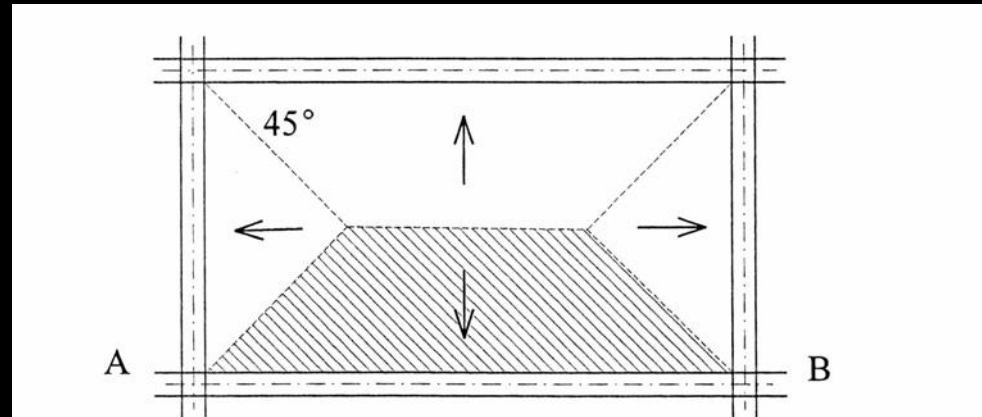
Supporting beams' contributing areas for reinforced concrete floor system.
